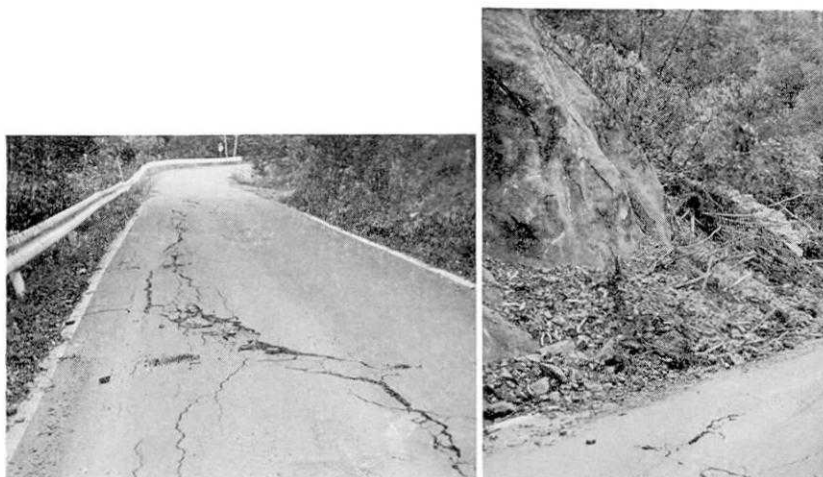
Cracks and minor landslide at Loc. i, looking southeast (left) and northwest (right).
